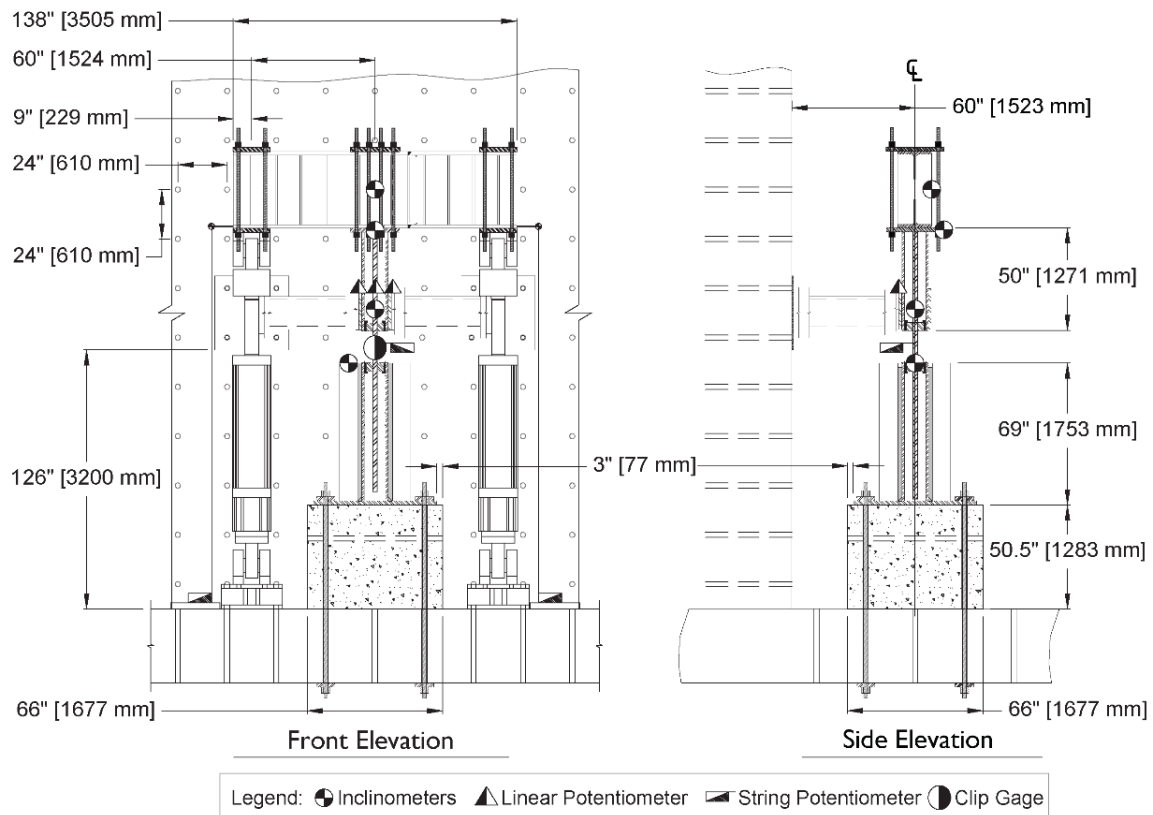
Loading apparatus front and side elevations with overall dimensions and instrumentation layout.
